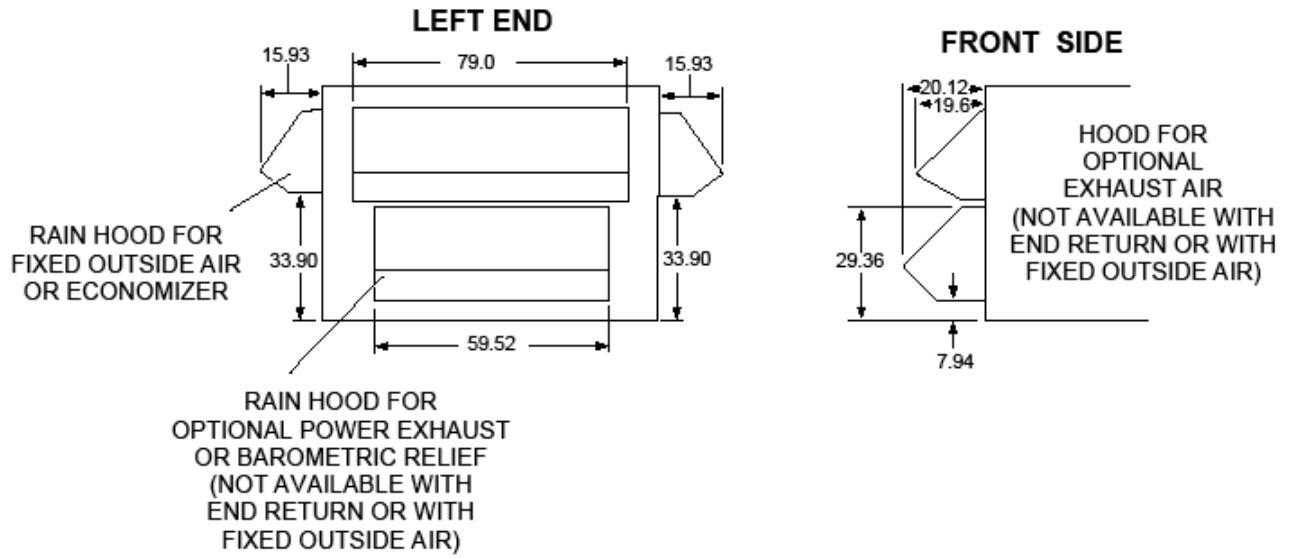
CLEARANCES - HOOD/ECONOMIZER & MOTOR DRIVE - FRONT & END
